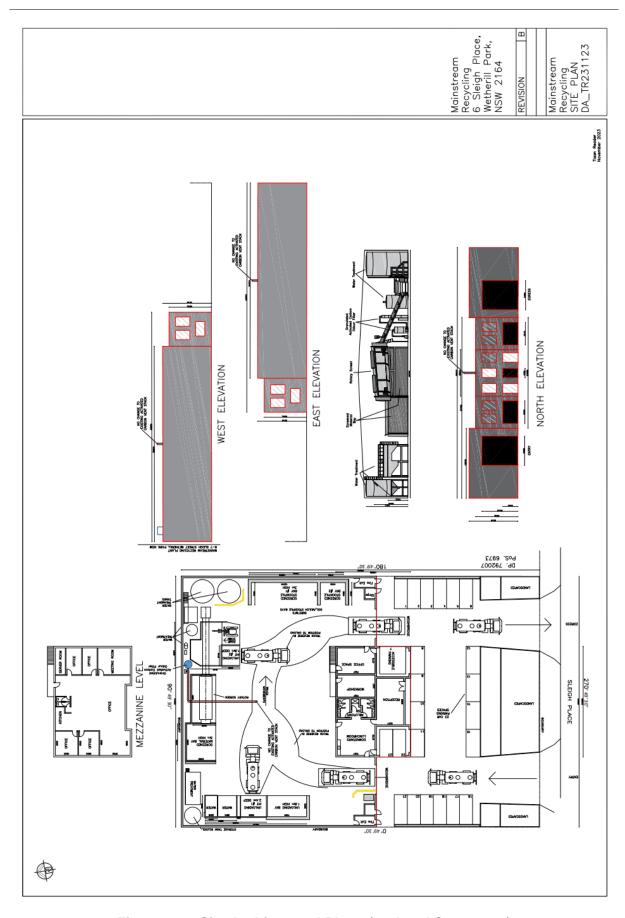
Site Architectural Plans (updated Sept. 2024)
